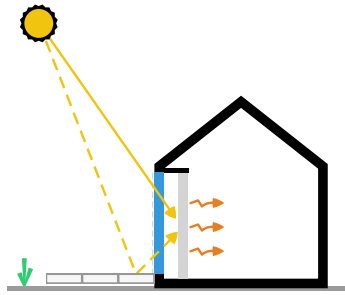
A reflecting pavement next to the building reflects solar radiation to the thermal storage wall.
